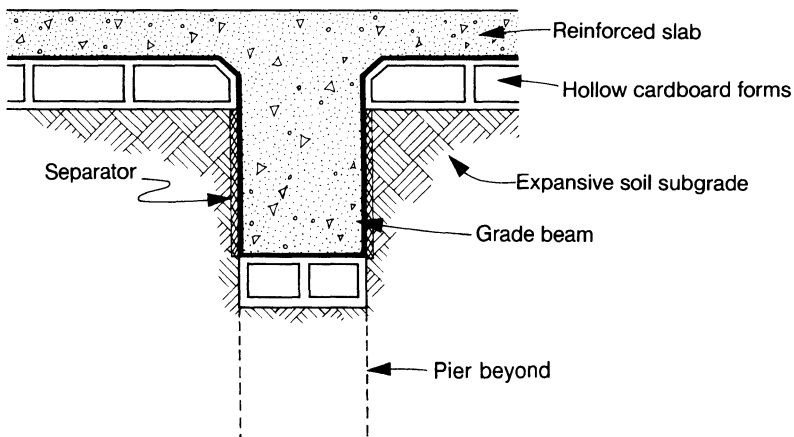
Construction of slab on ground with hollow cardboard forms.
